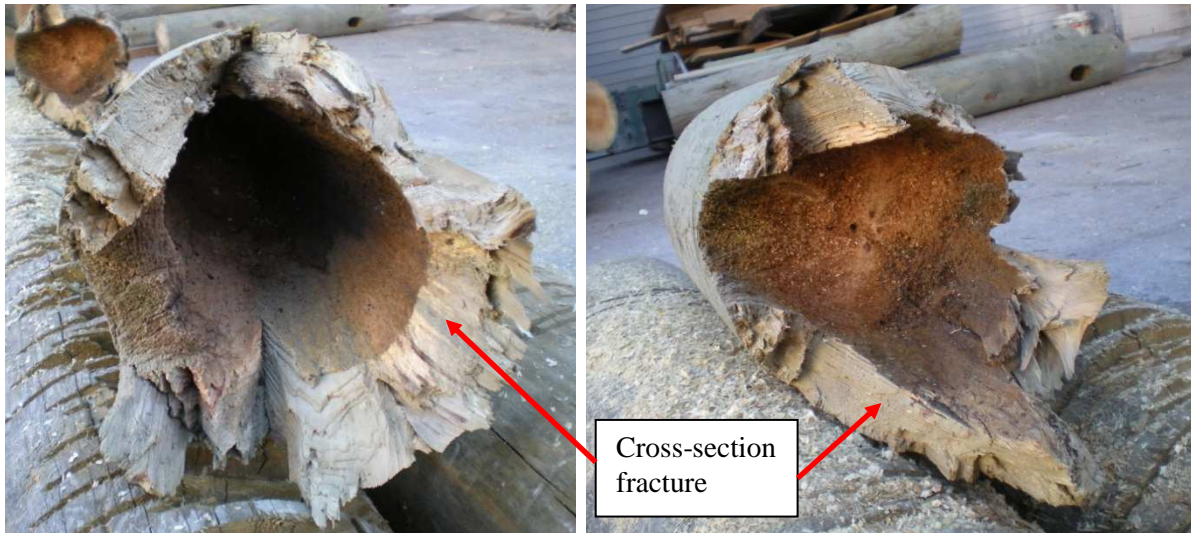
Cross-section of in-service specimen with compression damage (RP-3-1).
